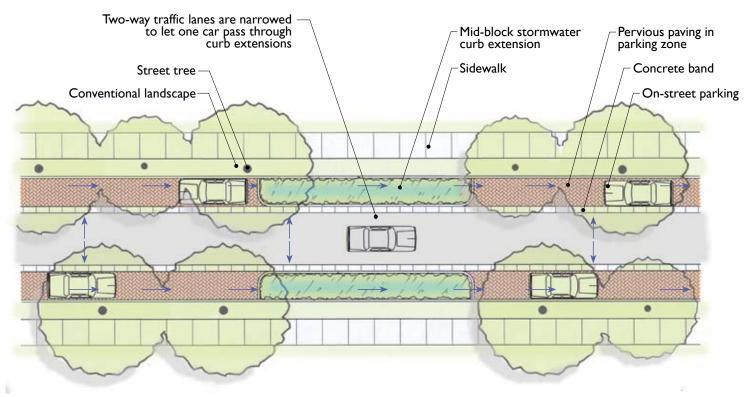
Mid-Block Stormwater Curb Extension (Symmetrical Layout)-Plan
